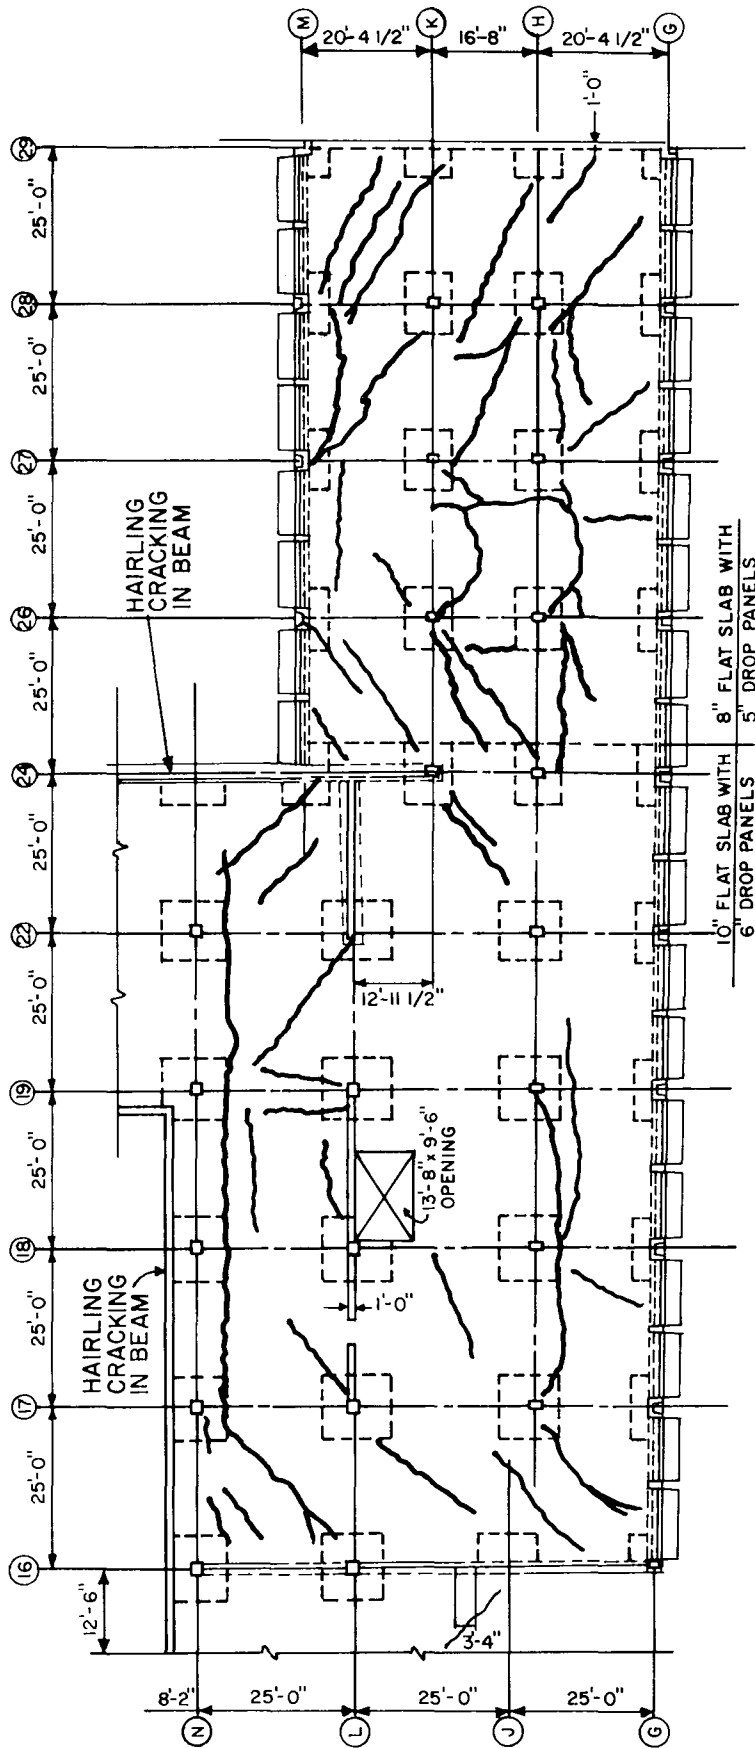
CRACKING PATTERN OBSERVED AT TOP SURFACE OF SECOND FLOOR SLAB, WING D
